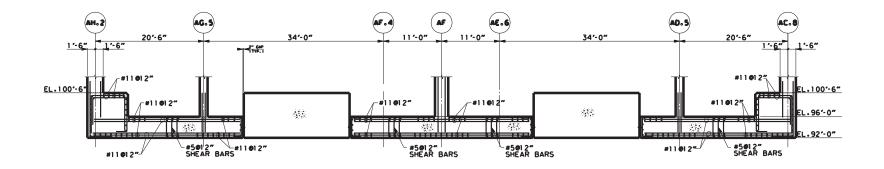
A-54 Typical Reinforcement of the EDG Building Basemat
